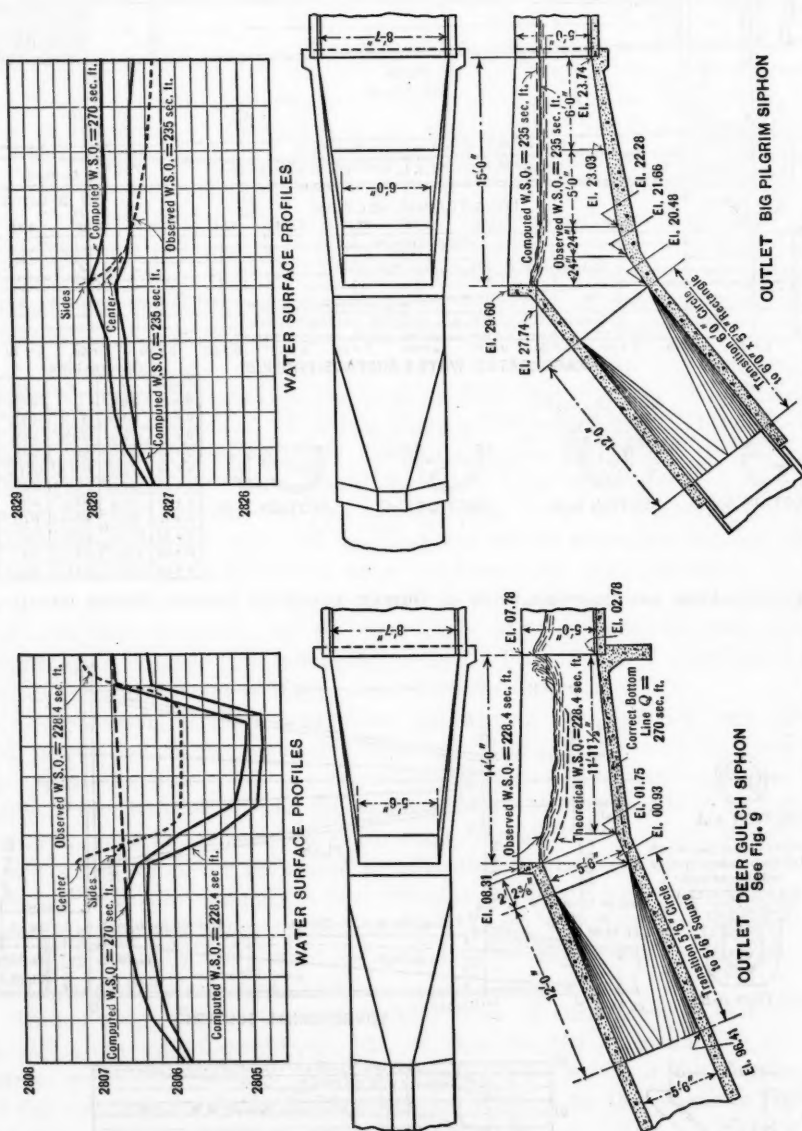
GOOD AND POOR SIPHON OUTLETS OF SIMILAR DESIGN.
